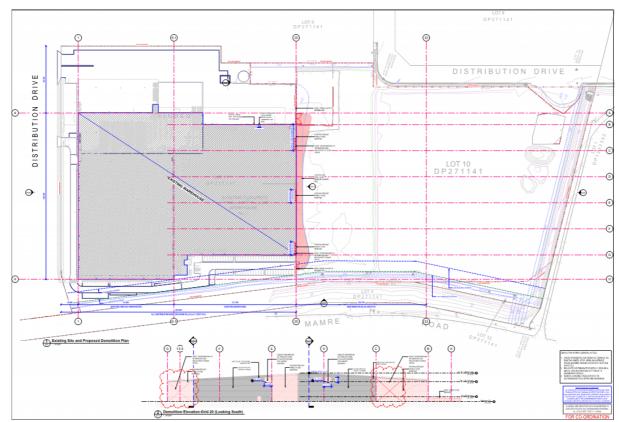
Demolition Plan (Source: HLA Architects, 2021)
